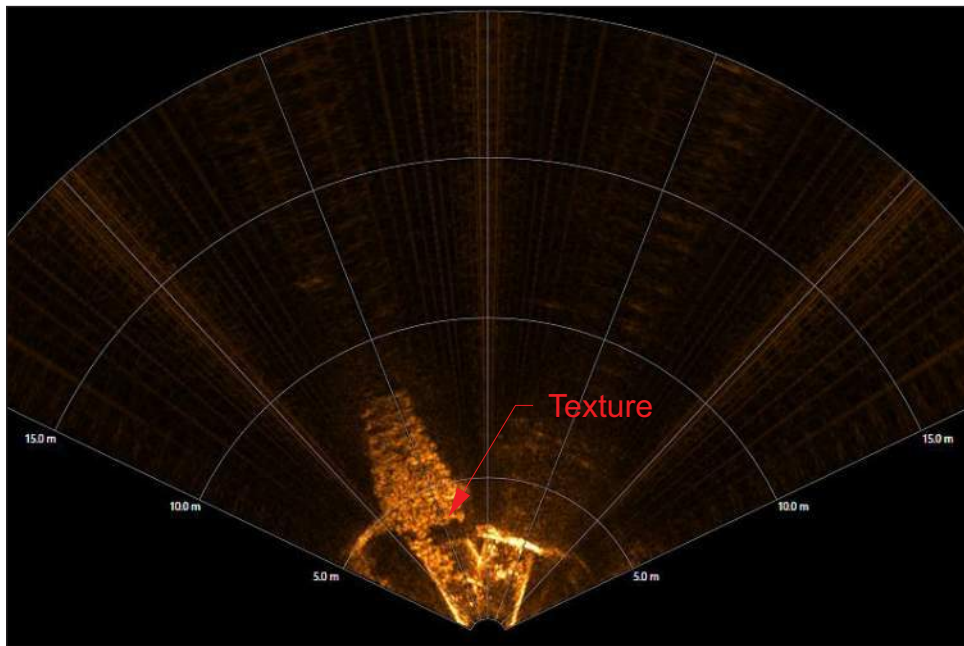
B-4: Sonar image at 175 feet downstream of Manhole 3. Texture on invert within outfall
